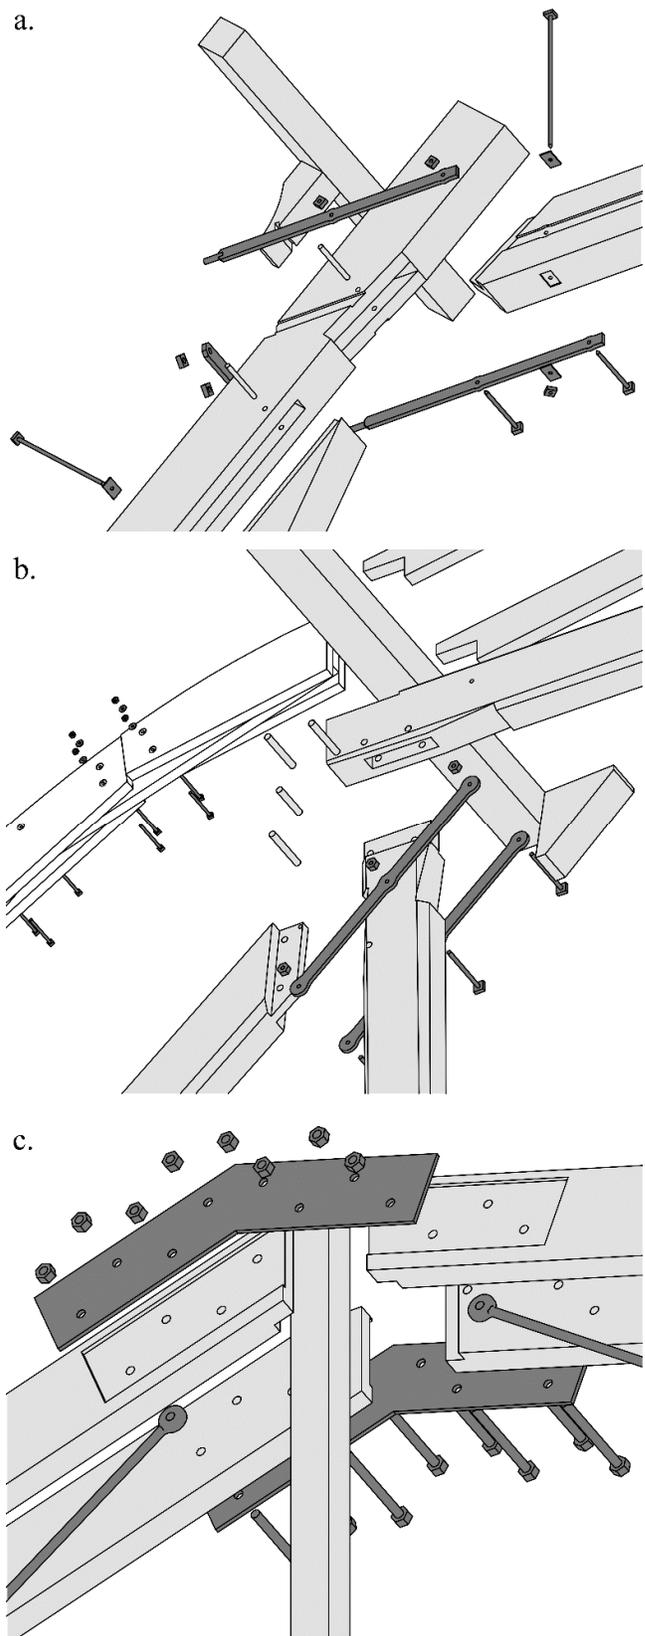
a. Iron straps and bolts fastenings. Span: 13 m (*Immaculée Conception church, Brussels, 1856*).
